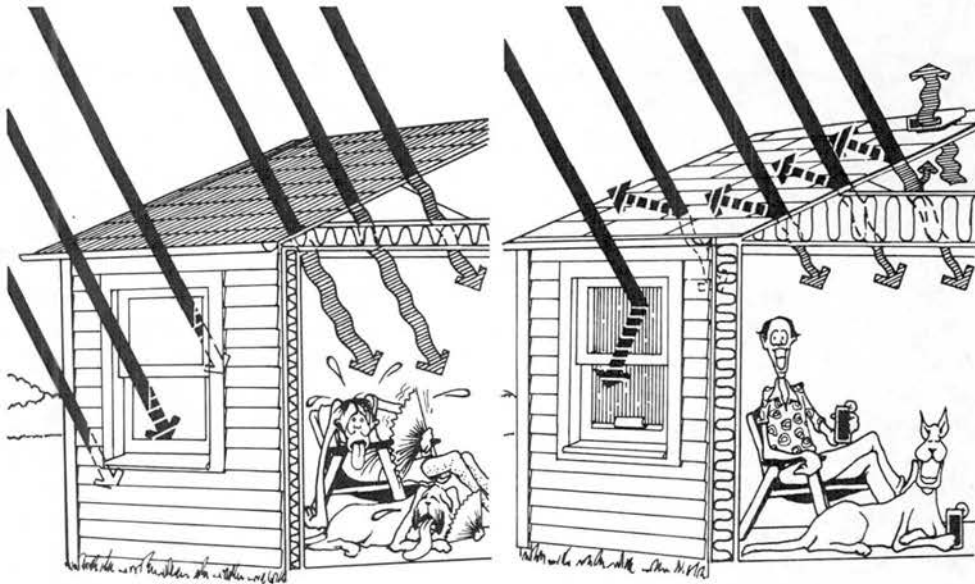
By increasing building insulation, especially in the roof, you will minimize heat gain through the ceiling. The other treatments shown here are changing the roof material (when it's time to reroof) from a dark to a light color, increasing wall insulation and using window shades.
